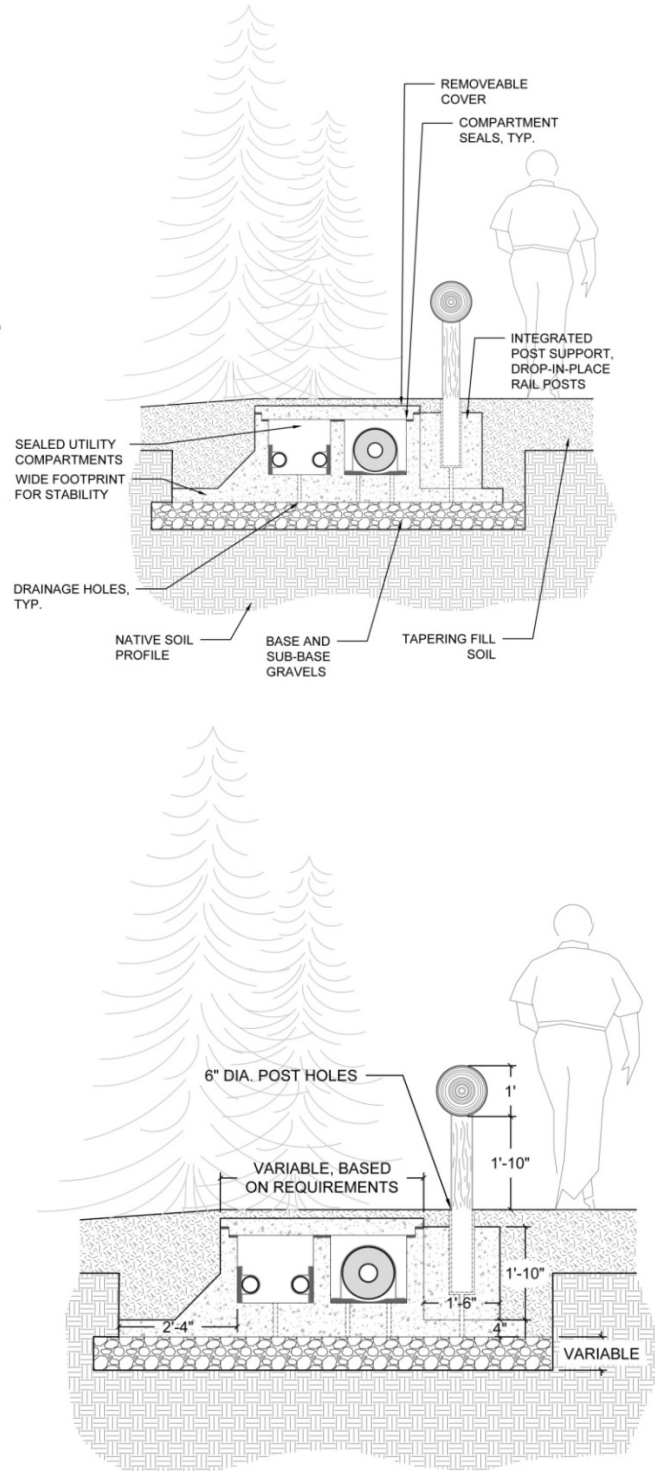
Cross-sectional detail of the rail barrier utilidor. Take special note of the structure-to ground connections, which provide the structural integrity of a design of this style.
